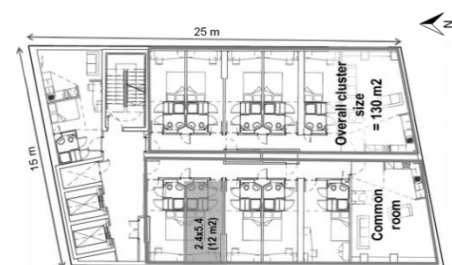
Typical floor layout (Source: Feilden Clegg Bradley Studios LLP)
